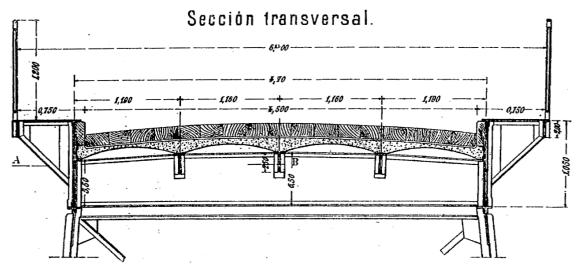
Cross section of the Requejo Bridge, corresponding to the project developed by the engineer Jose Eugenio Ribera Dutaste (Ribera Dutaste, 1914).
